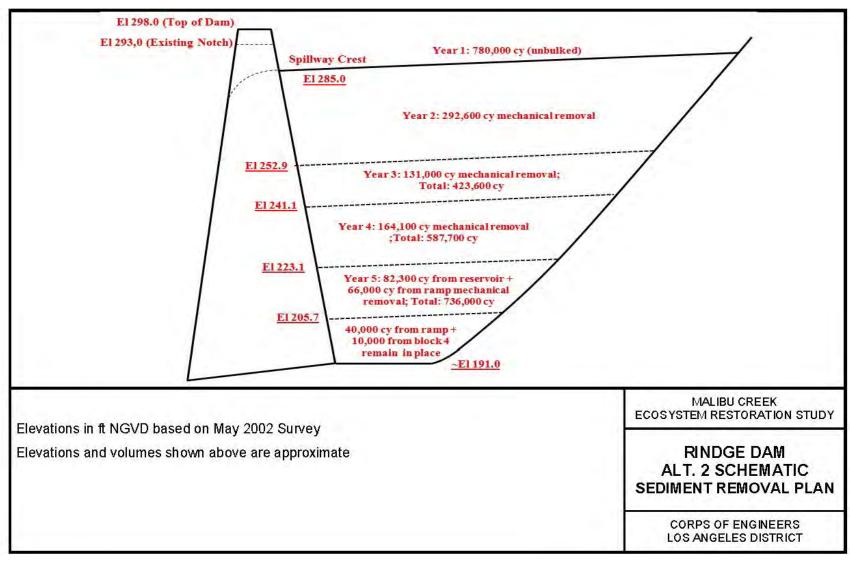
Rindge Dam - Alt. 2 Schematic Sediment Removal Plan
